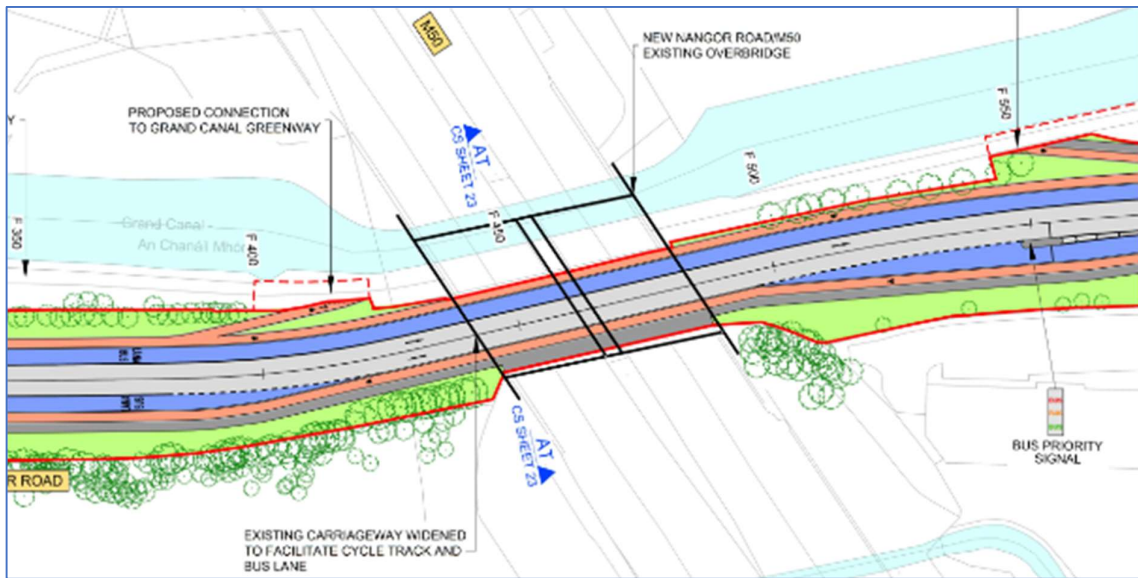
Extract of General Arrangement Drawings at R134 New Nangor Road interface with M50 overbridge (Sheet 46)
